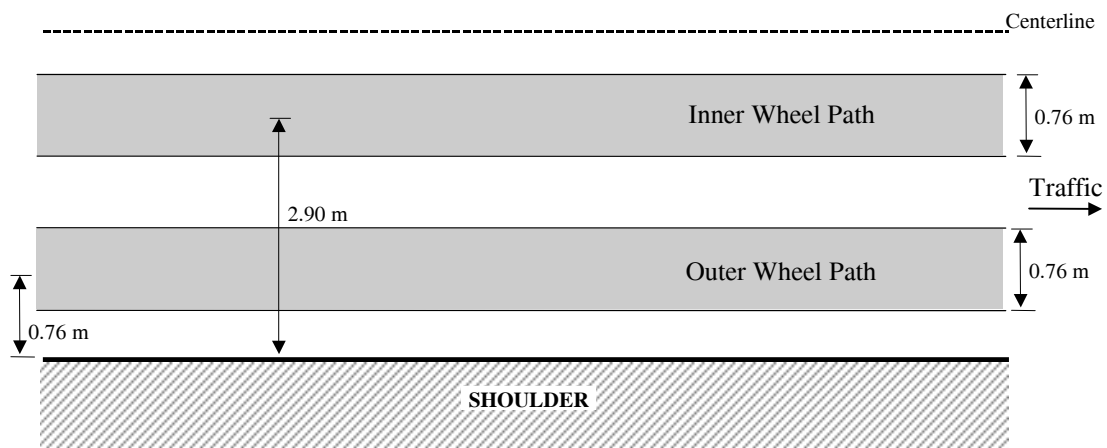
Location of Wheel Paths in Asphalt Concrete-Surfaced Pavements
